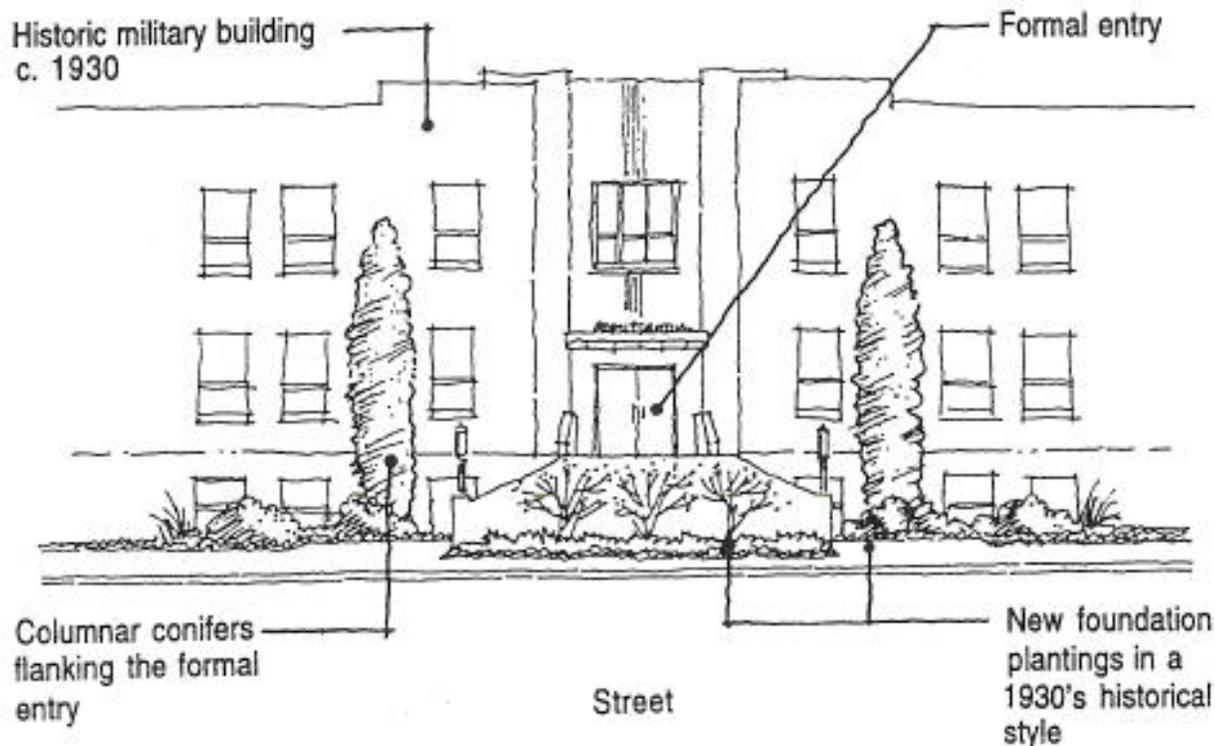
Formal entry landscape at former Navy buildings
